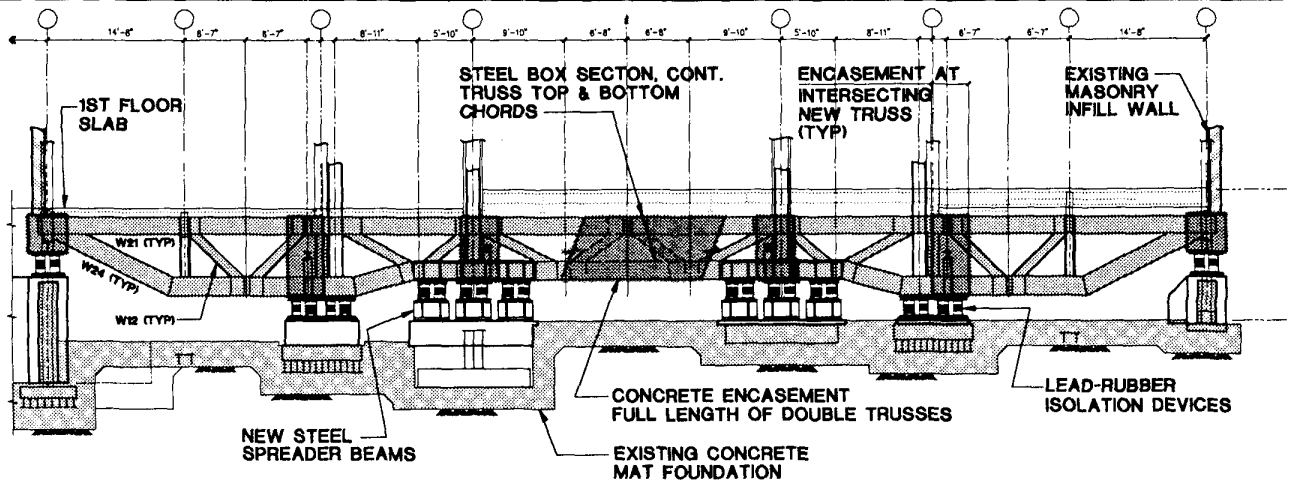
NEW STEEL FRAMING PLAN ABOVE ISOLATORS IN BASEMENT
